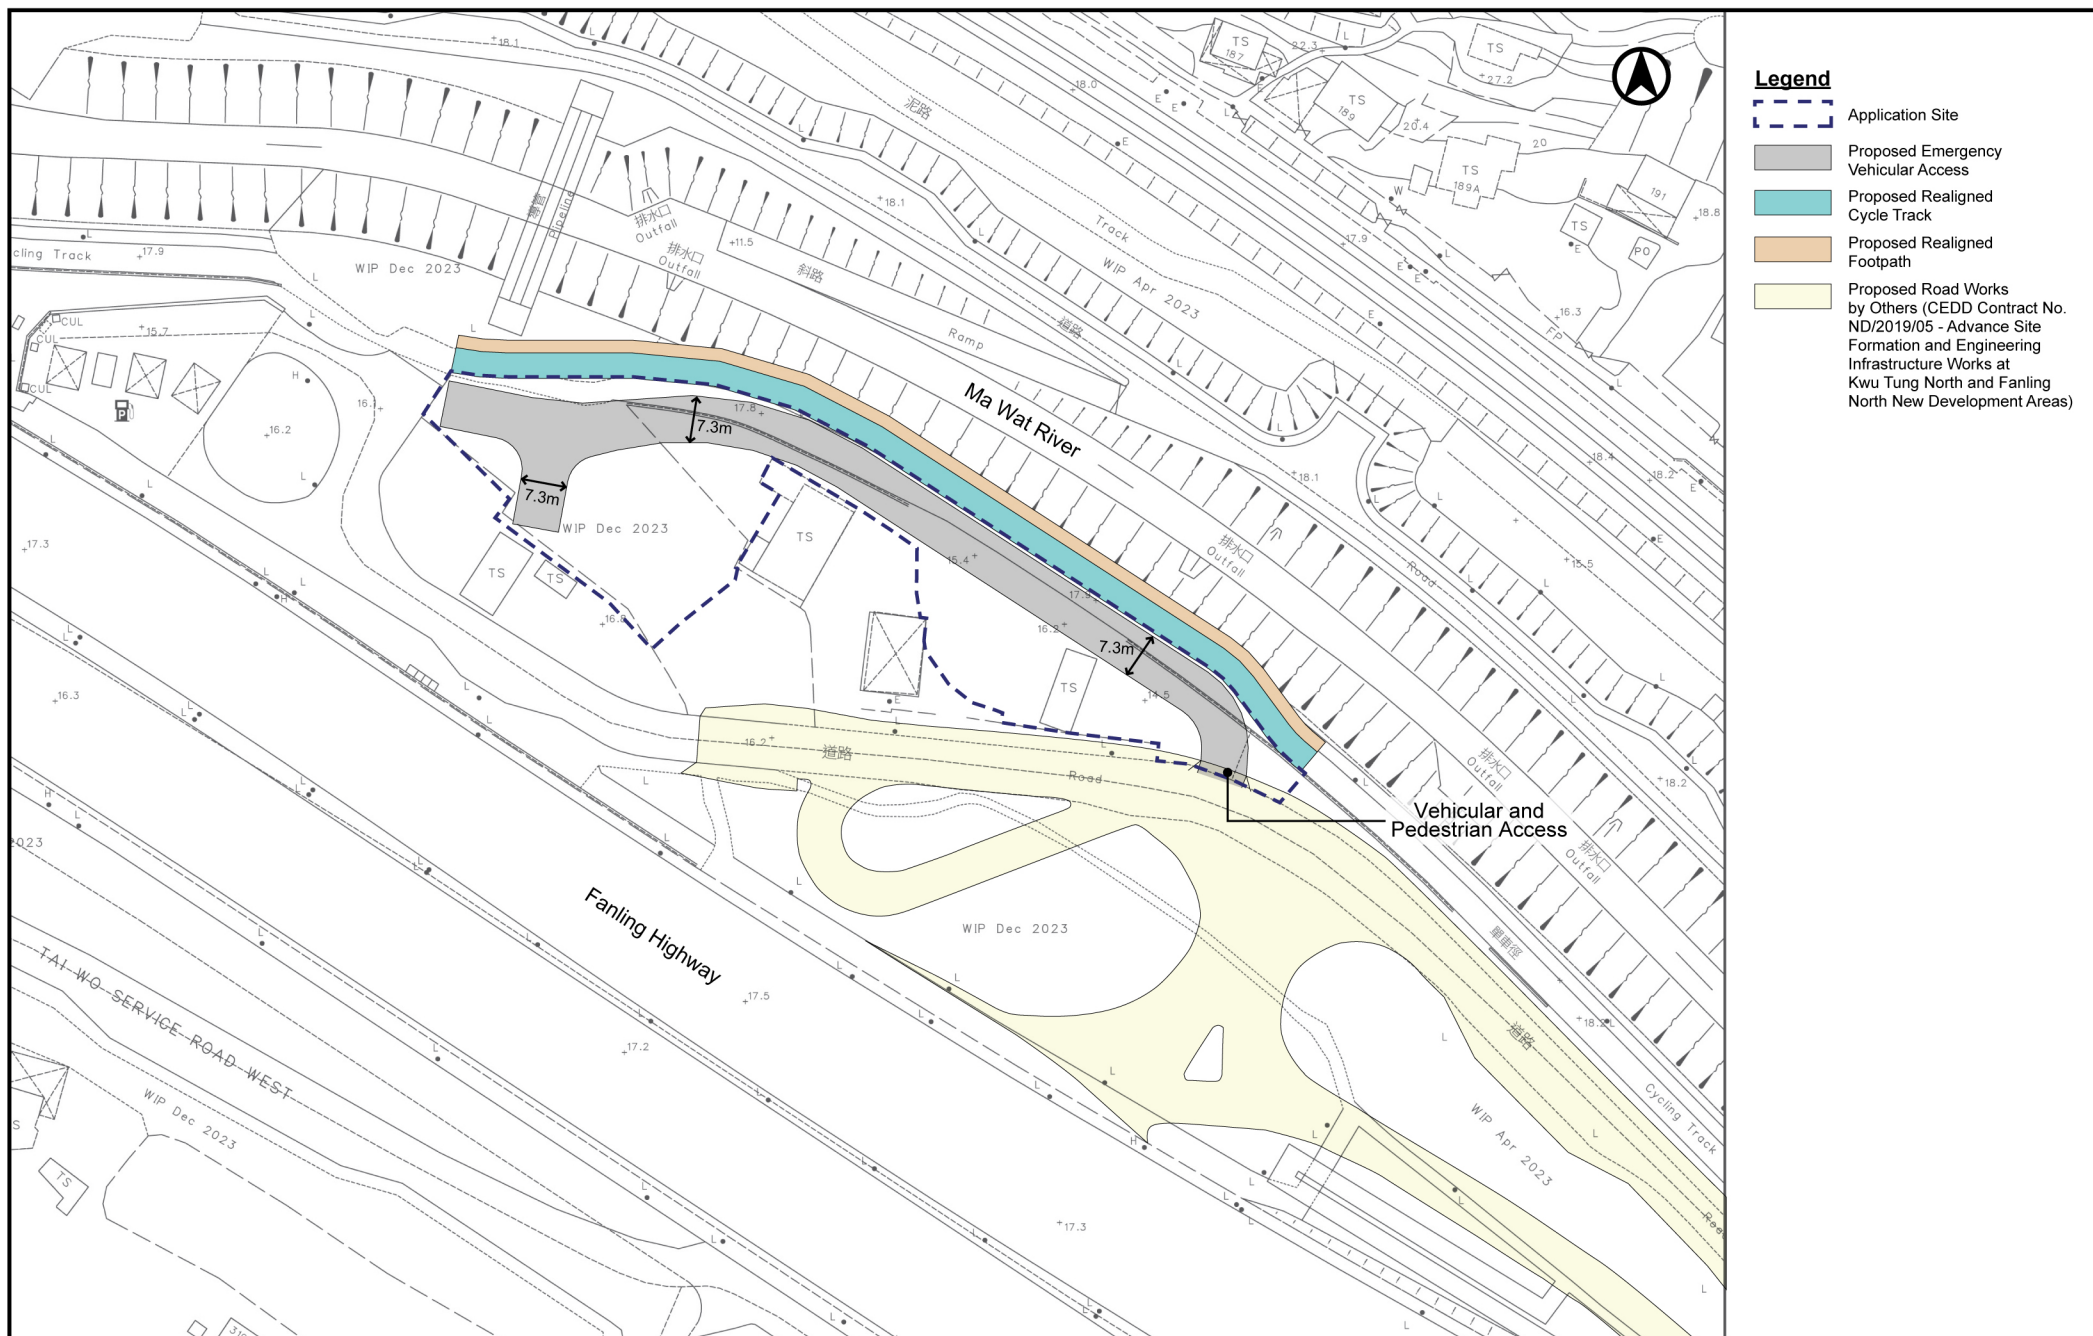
REALIGNMENT PROPOSAL OF EXISTING FOOTPATH AND CYCLE TRACK
